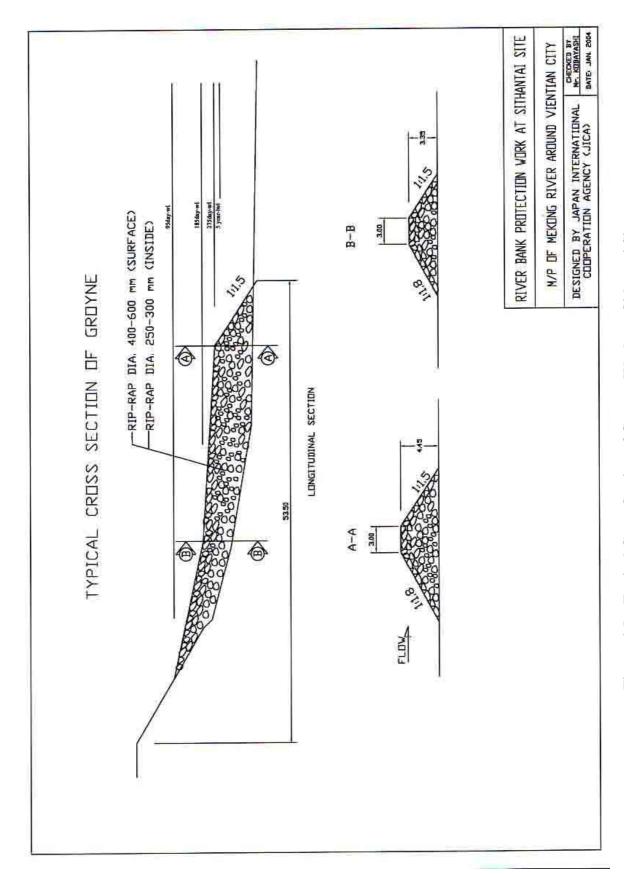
Typical Cross Section of Groyne Works at Sithantai Site
